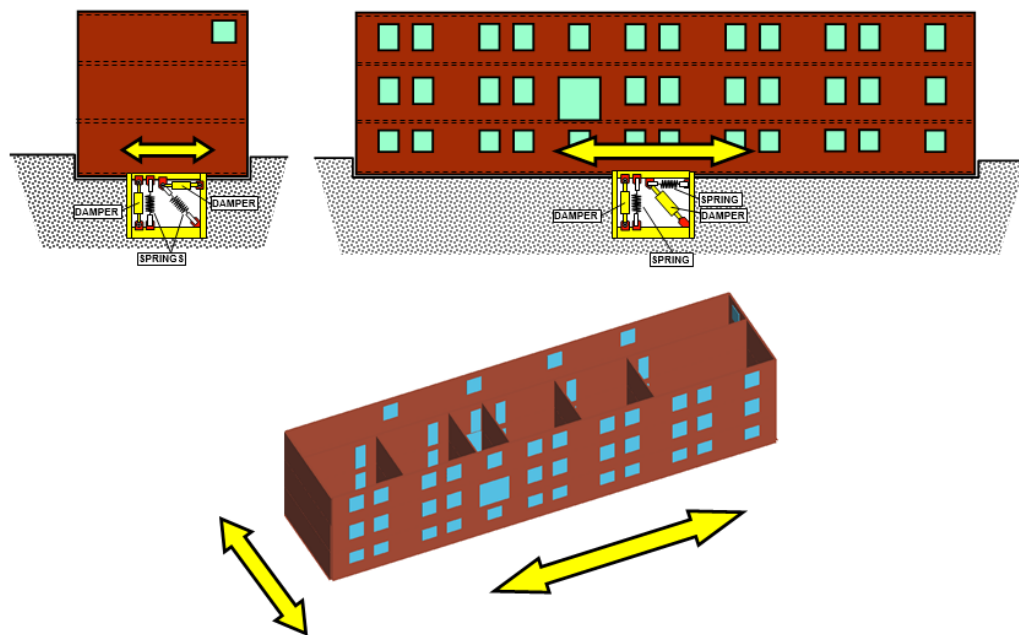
Soil modeled by springs and dampers of the Islamic Revolution School, Tabriz,
